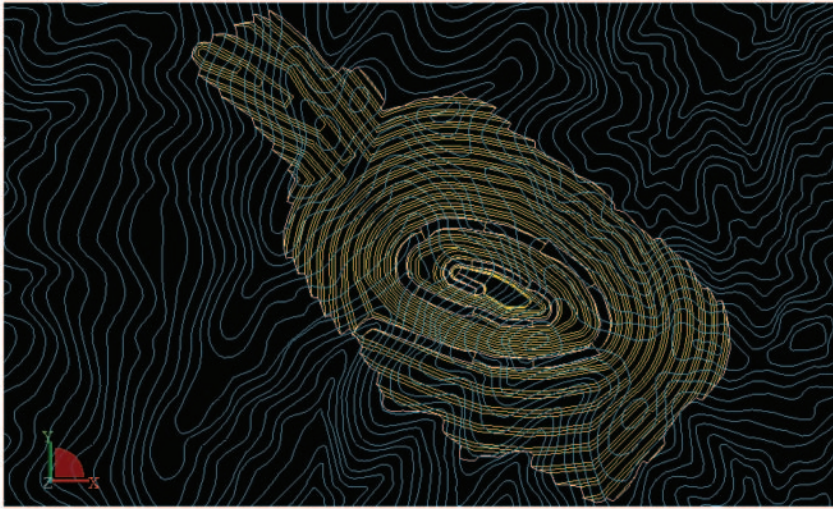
Plan View of the Jinfeng Open-pit Design
